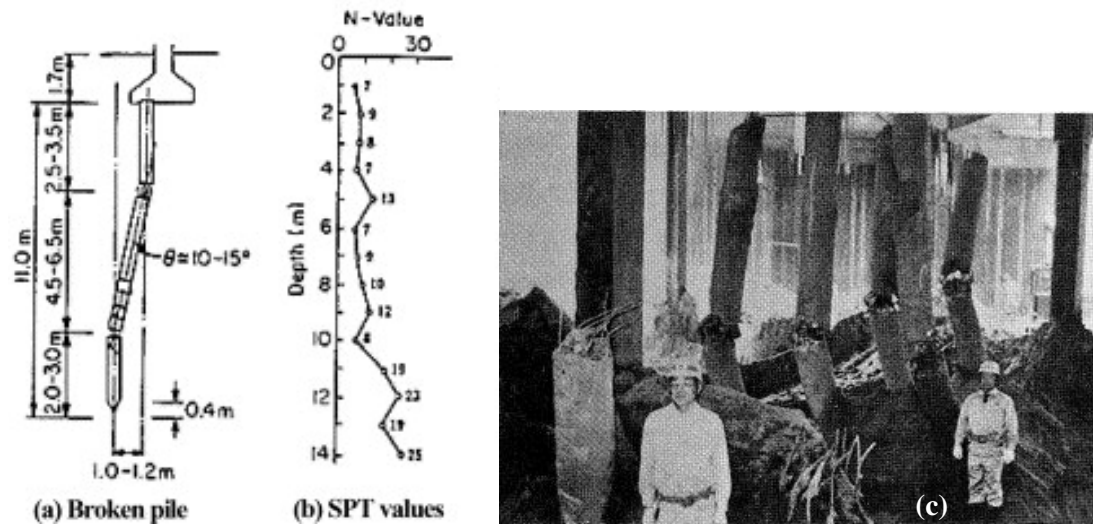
Damage to piles of NHK Building: (a) schematic, (b) SPT profile, (c) photo of piles after excavation (Hamada and O'Rourke 1992)
